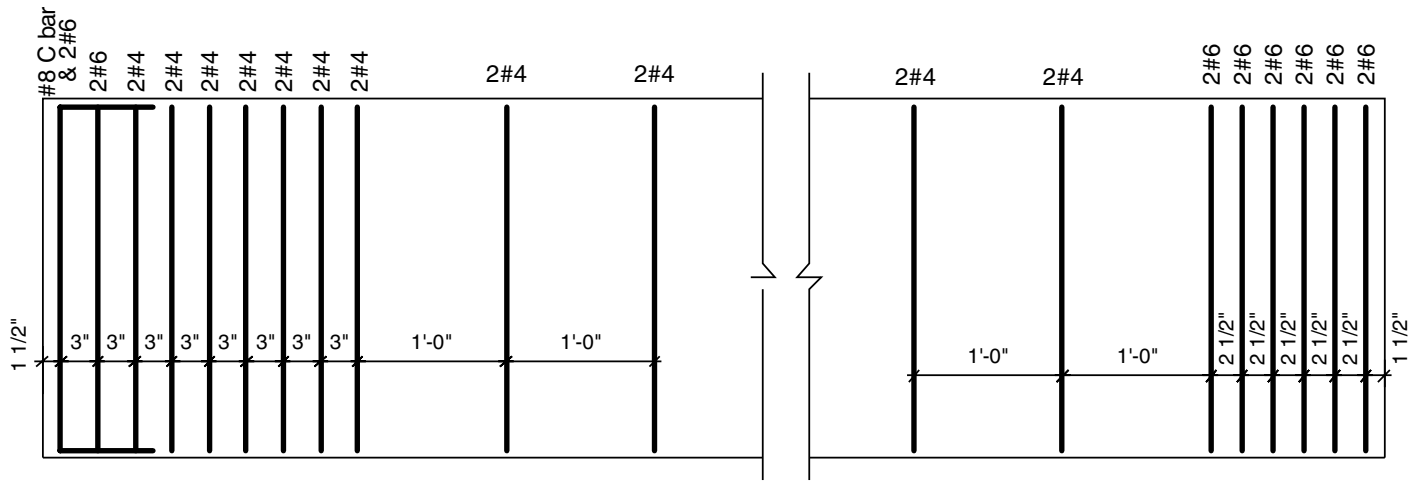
End zone reinforcement details of WA1L (proposed) and WA1R (LRFD).
